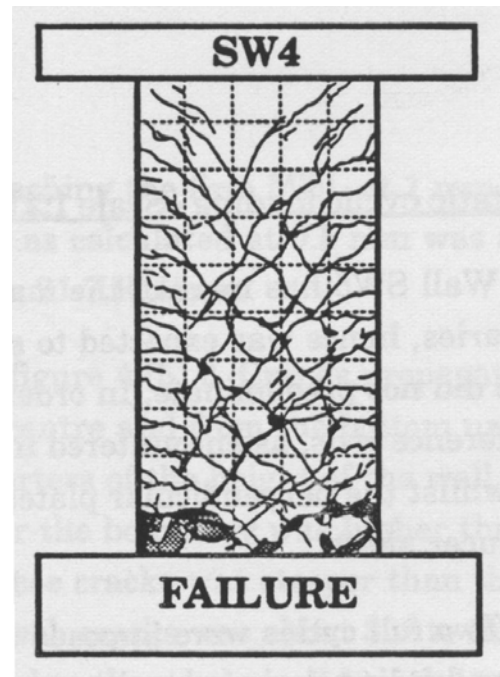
presents the final condition of a squat wall that failed by flexure-sliding shear [wall 1, Synge (1980)]. Walls with light vertical web reinforcement, no boundary element reinforcement, and low axial forces are susceptible to this type of failure.
